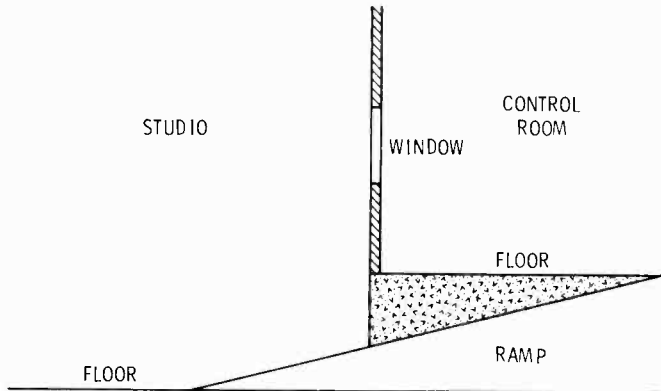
The floor of the control room should be higher than that of the studio. Use a ramp instead of steps to connect the two rooms.
